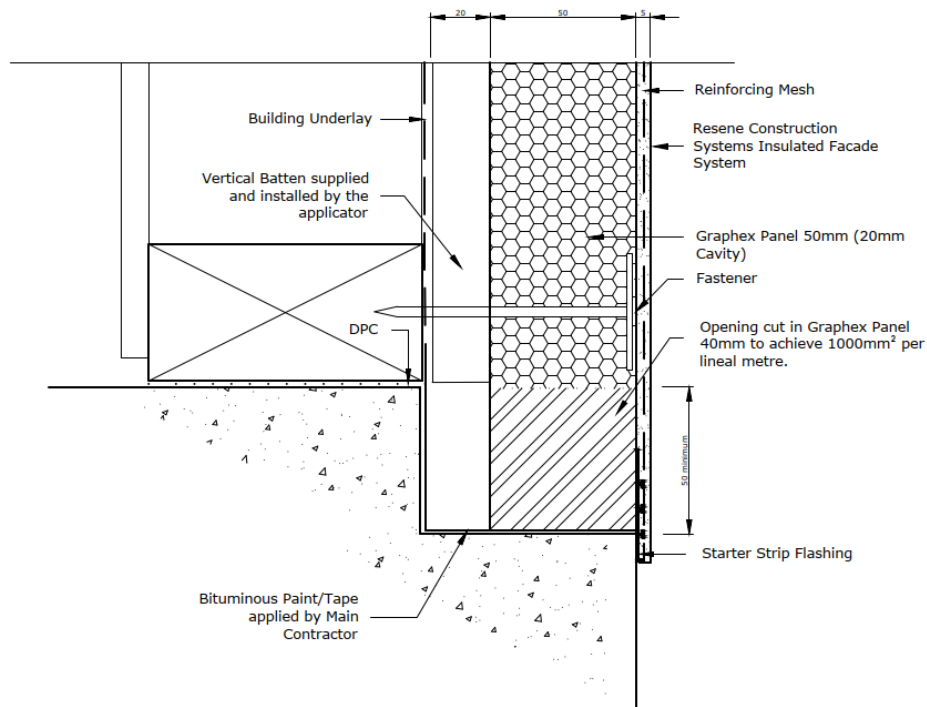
Ventilation openings at 1000mm<sup>2</sup> per linear meter of wall.
